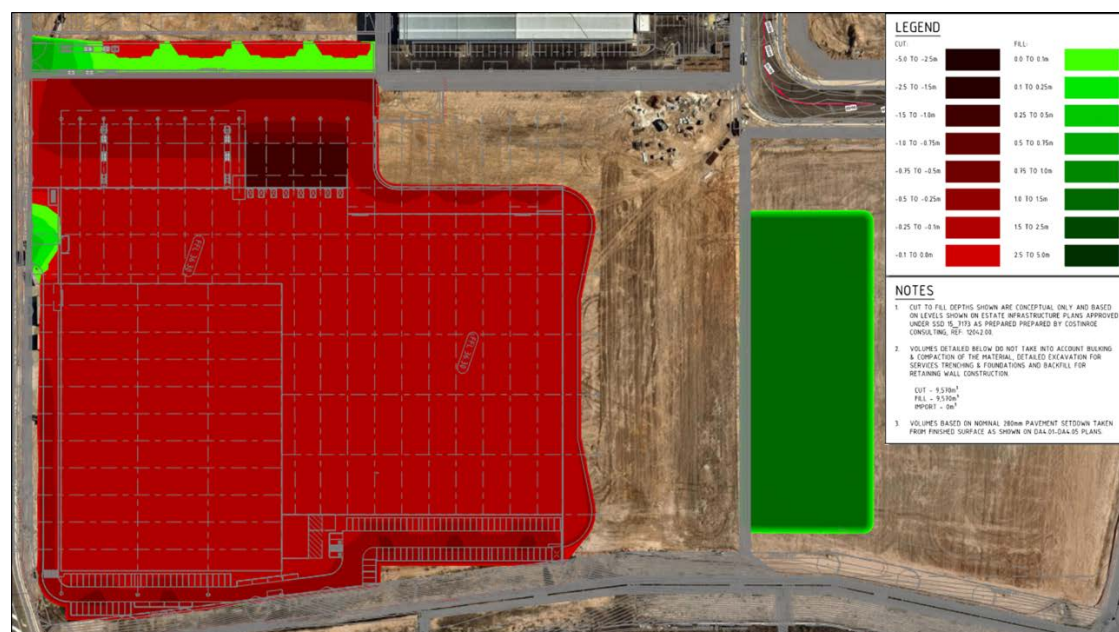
Proposed Earthworks Plan (Sparks + Partners, 2018)
